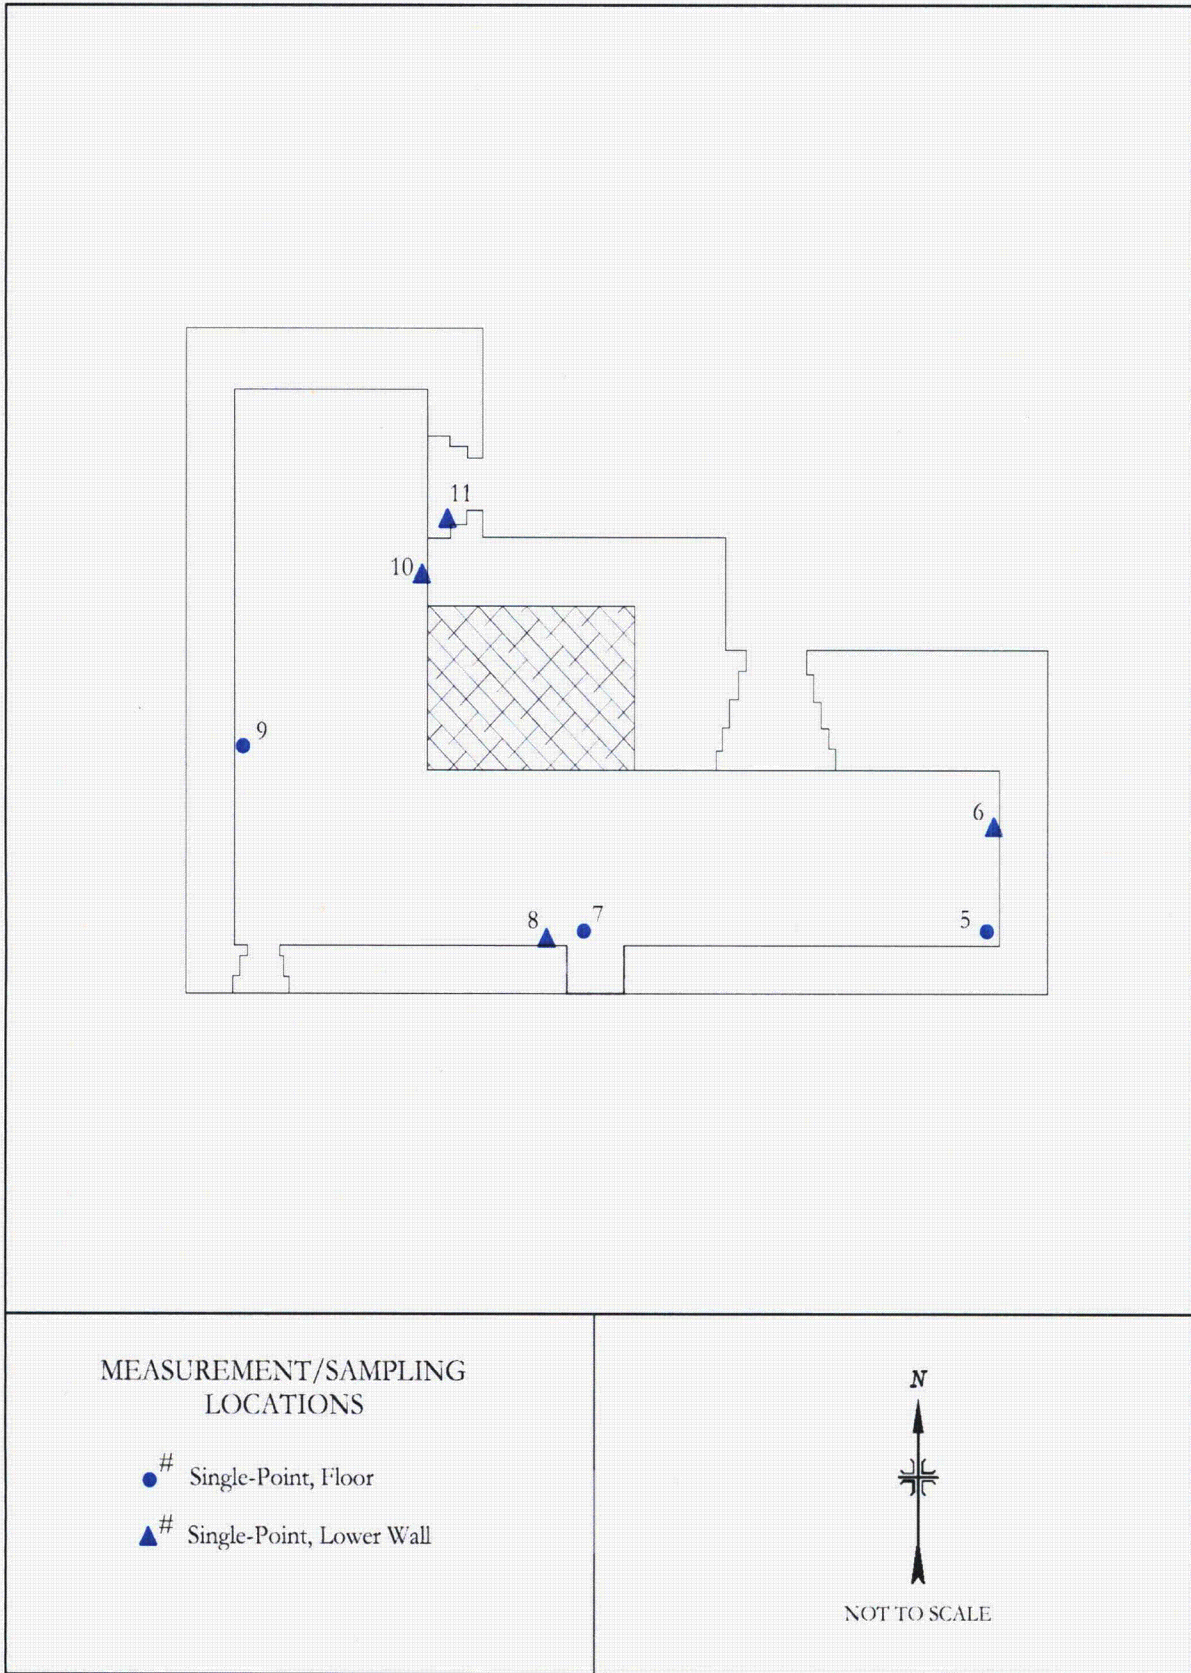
Auxiliary Building, Room 46 - Direct Measurement Locations
